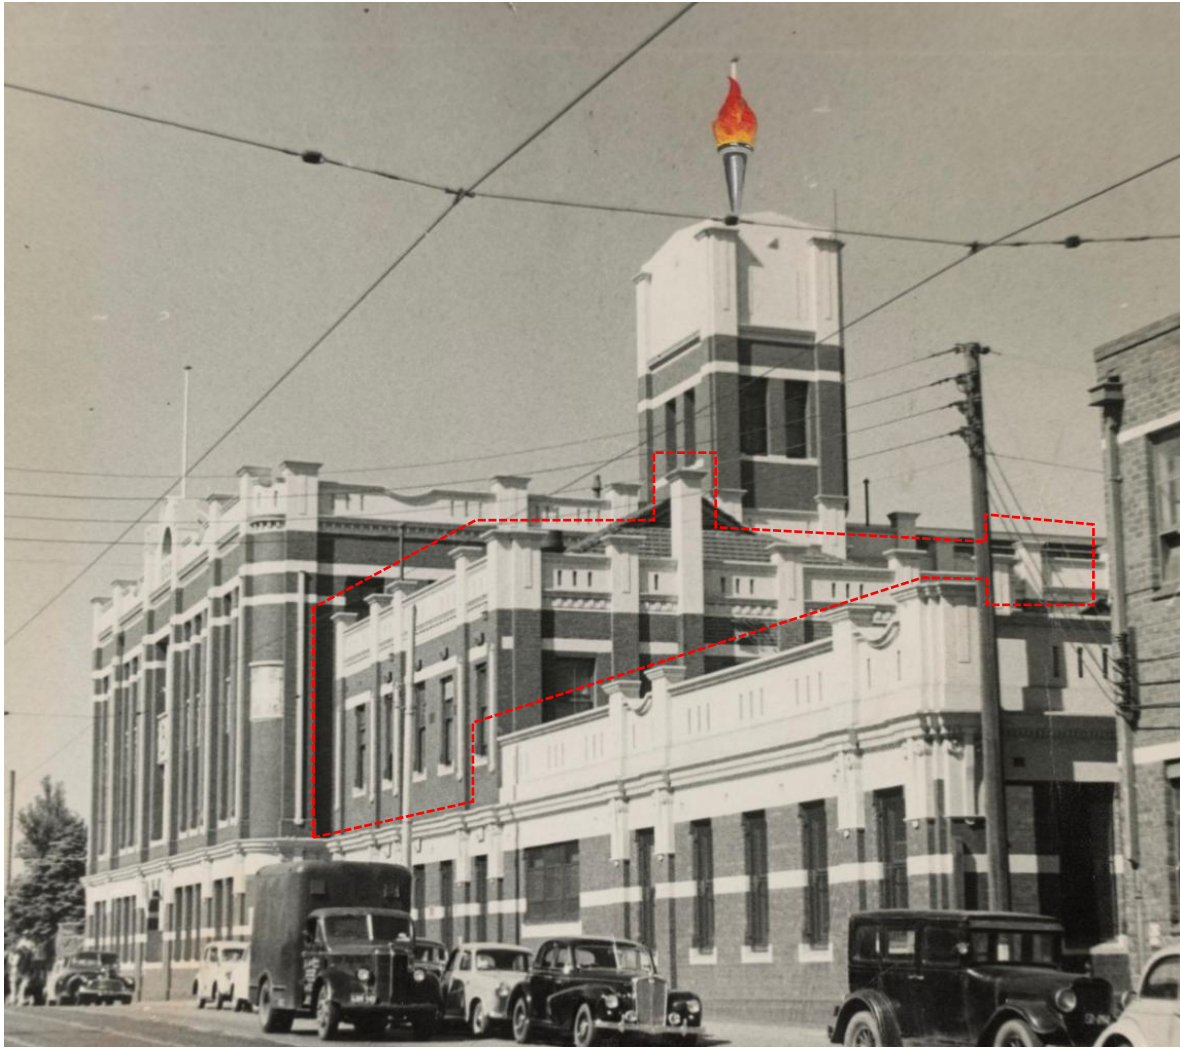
Image of the Bryant & May Match Factory, along Church Street, depicting first floor development. Cars indicate that image was captured in the late 1940s-early 1950's. Note that the northwest parapet is evident to the right (fourth engaged column to the right of chimney). Source: Bryant & May Factory, Richmond, Victoria, 1940-50, SLV, H2012.195/27.
